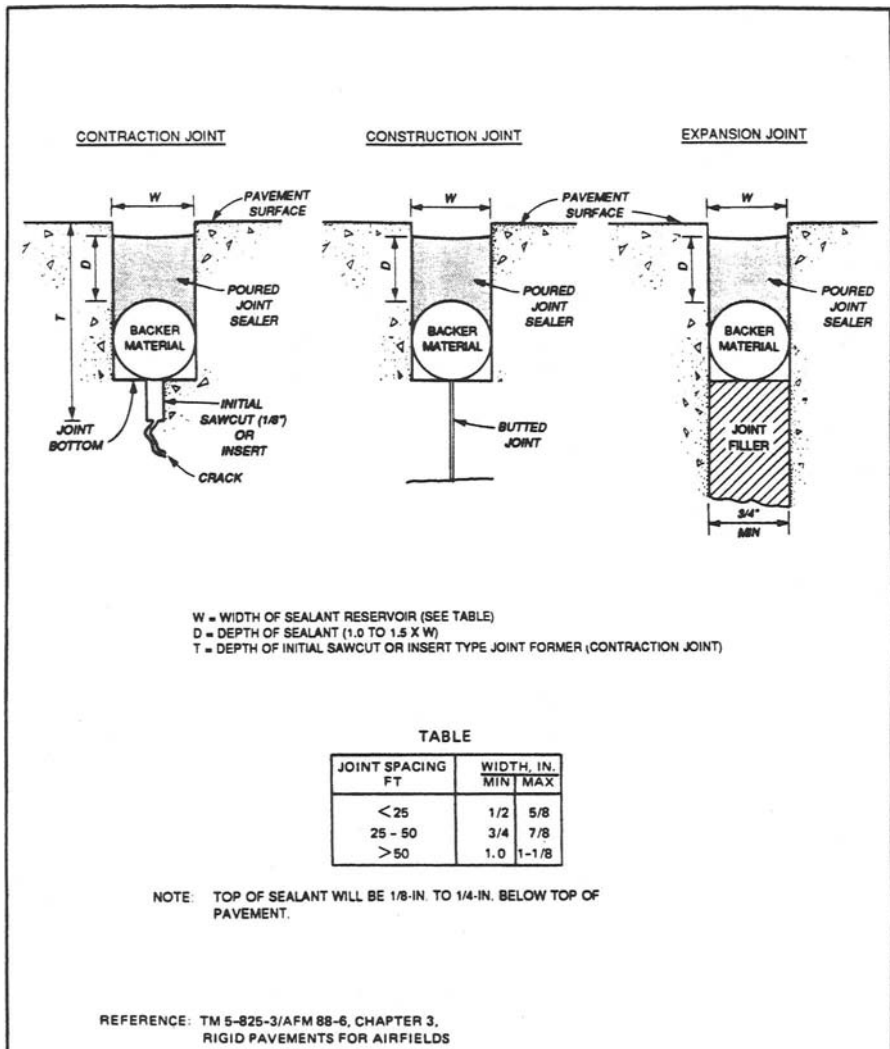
Joint Sealing of PCC Pavement (From U.S. Army and Air Force 1988).
